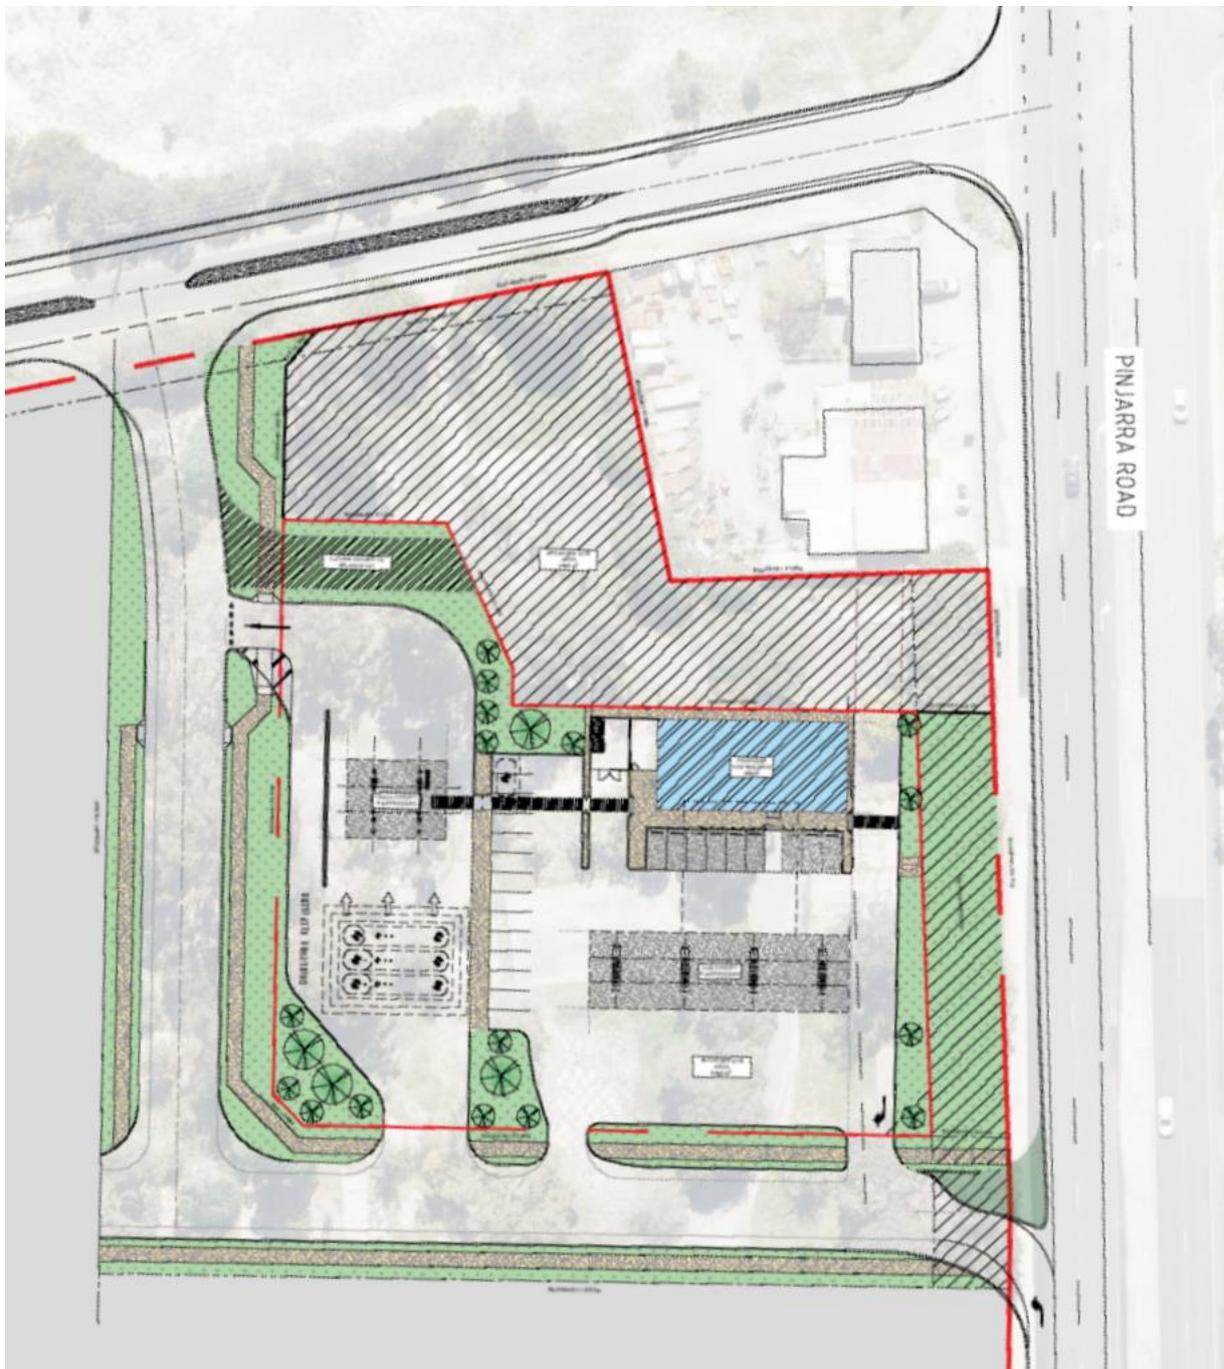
Indicative Existing Layout along Furnissdale Road and Pinjarra Road
